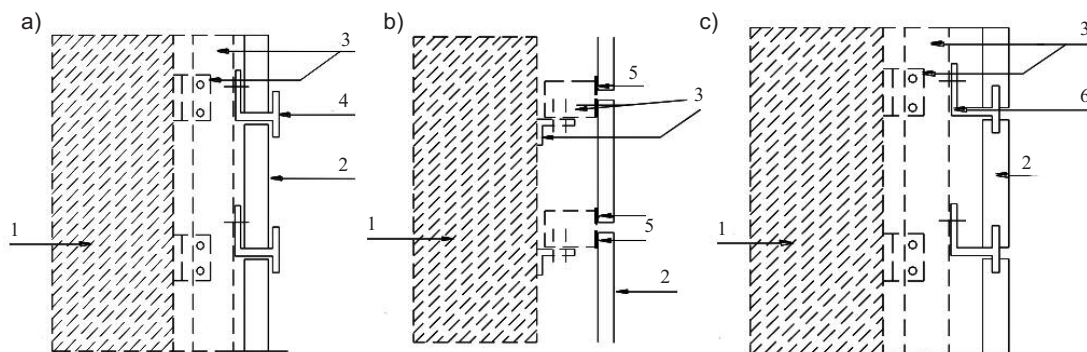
Ventilated façade systems with different types of cladding attachment: a) mechanical snap fastening; b) adhesive fastening; c) fastening using stone anchors; 1 – wall; 2 – cladding; 3 – substructure (bracket and batten); 4 – metal snap element; 5 – adhesive; 6 – stone anchor
